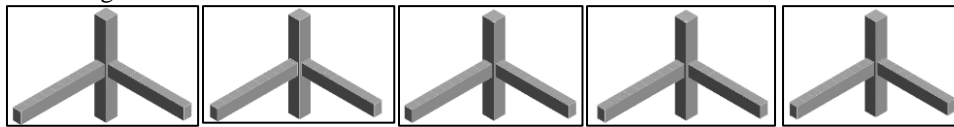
Corner Beam-Column Joint with 8mm, 10mm, 12mm, 14mm & 16mm Steel Retrofitting.
